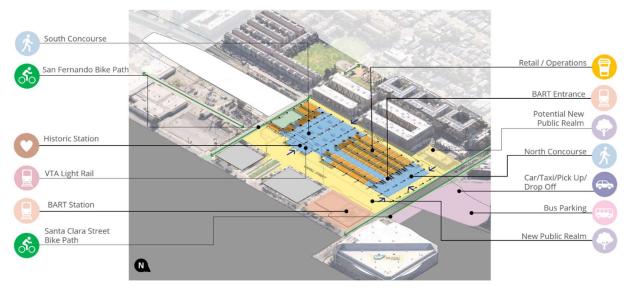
Layout of the concourse level and access to key station elements. This layout is common to both the At-Grade and Elevated Station Alternatives.
